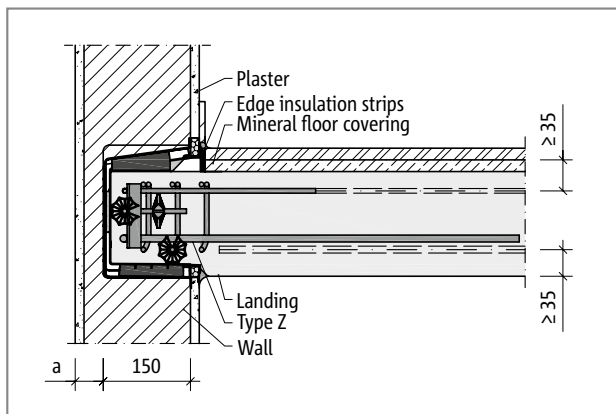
Schöck Tronsole® type Z: Fire protection configuration
